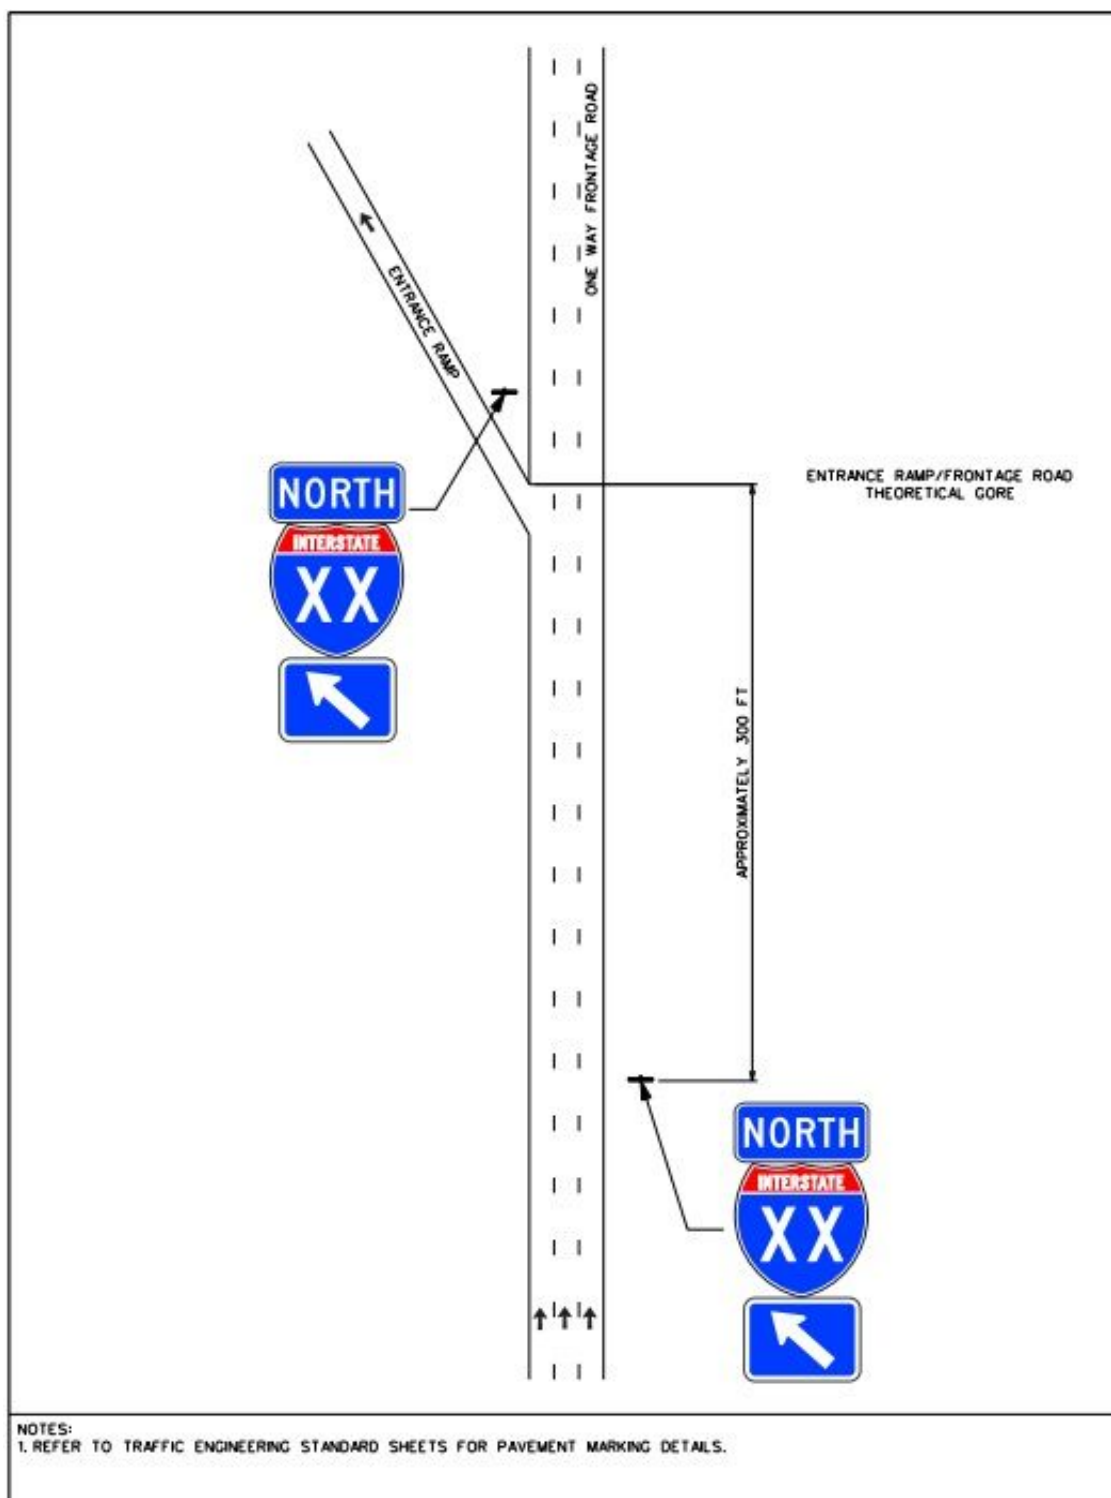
Typical signing for an entrance ramp from a one-way frontage road – diverge condition.
